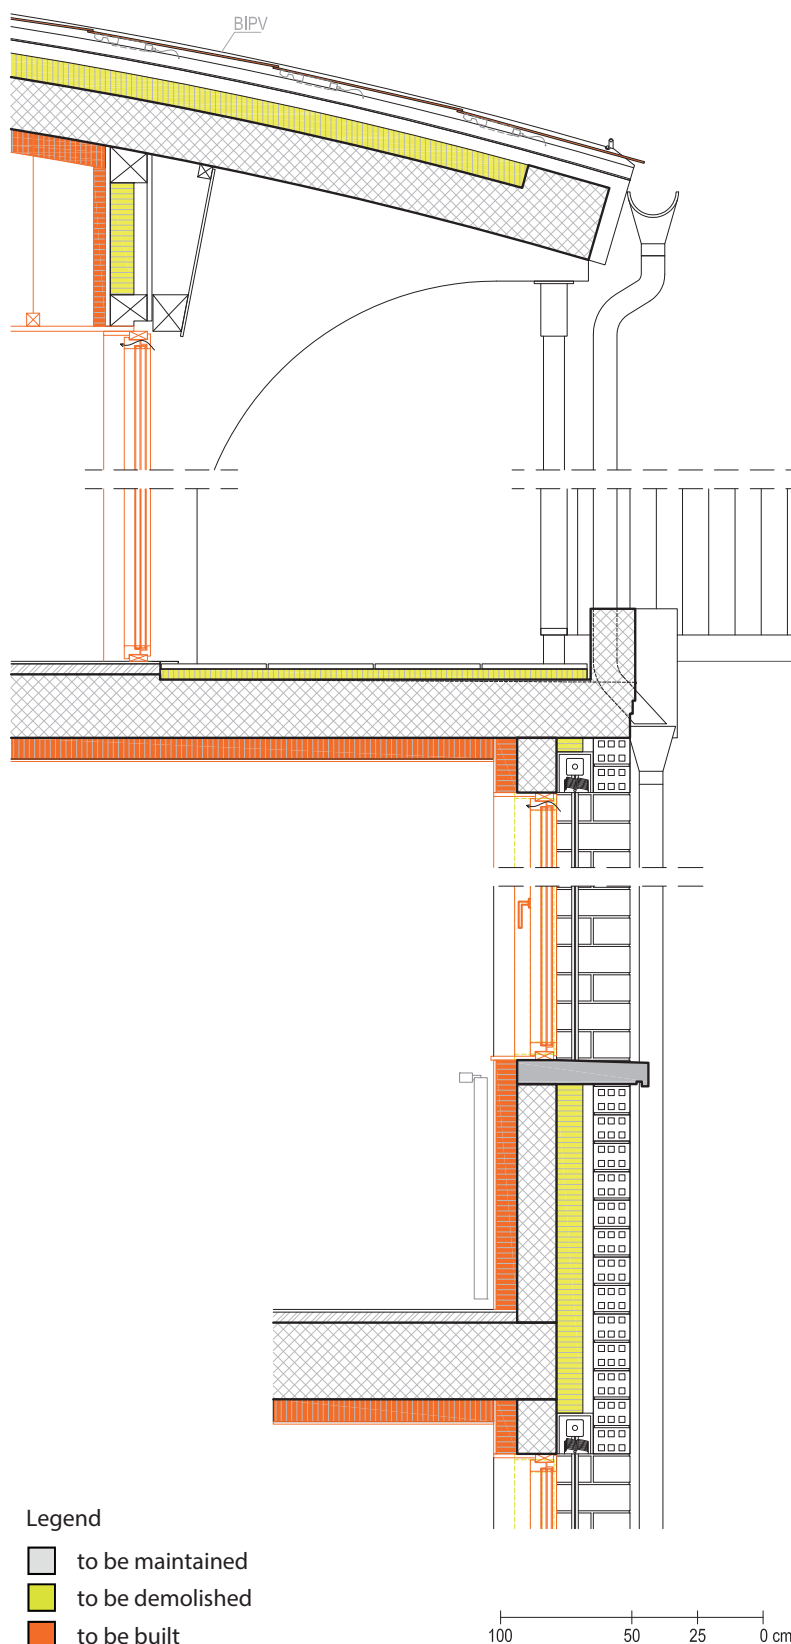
Façade constructive detail, S1-Conservation, Archetype 5.
